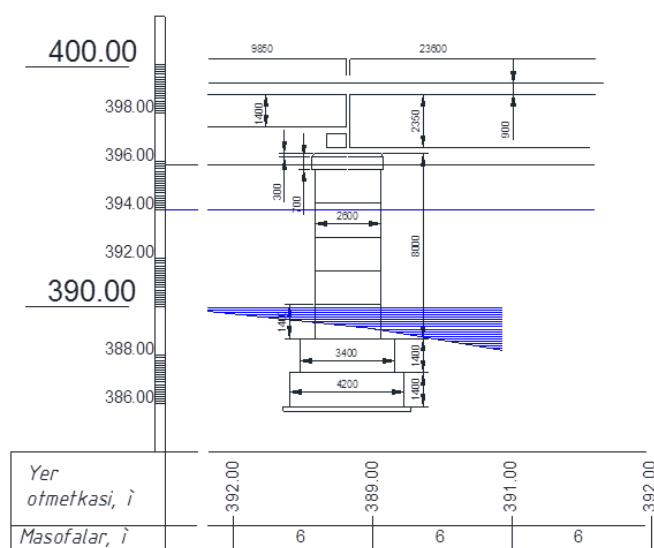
9.85+23.6+9.85m railway reinforced concrete bridge intermediate support located at PK 123+456 of Andijan – Asaka peregon
